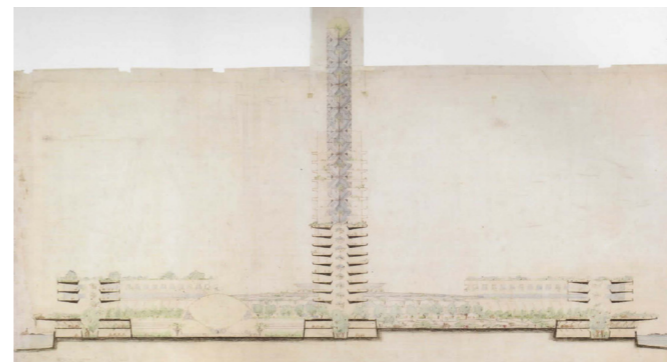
Pittsburgh Point Park Project. First Scheme. North-south section through lateral office buildings, tower, concert garden and zoo looking west, 1947.
